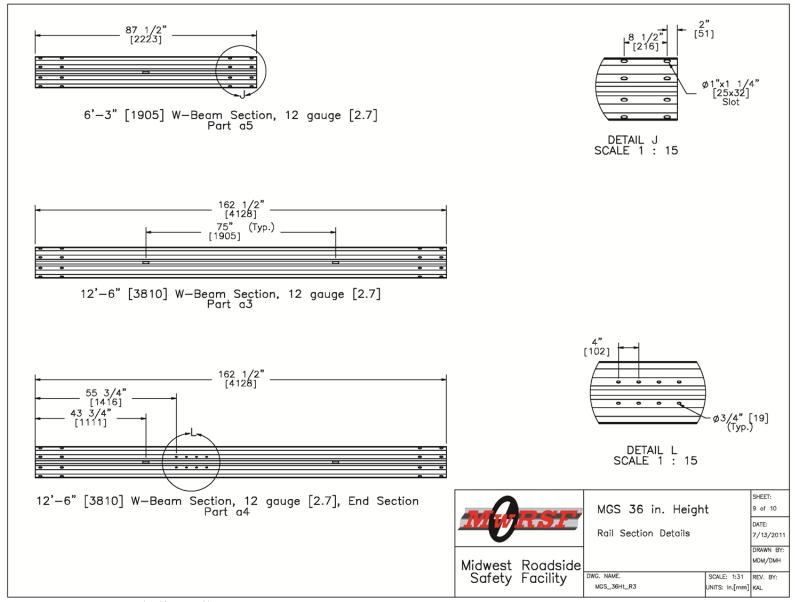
W-Beam Guardrail Details, Test No. MGSMRH-2
